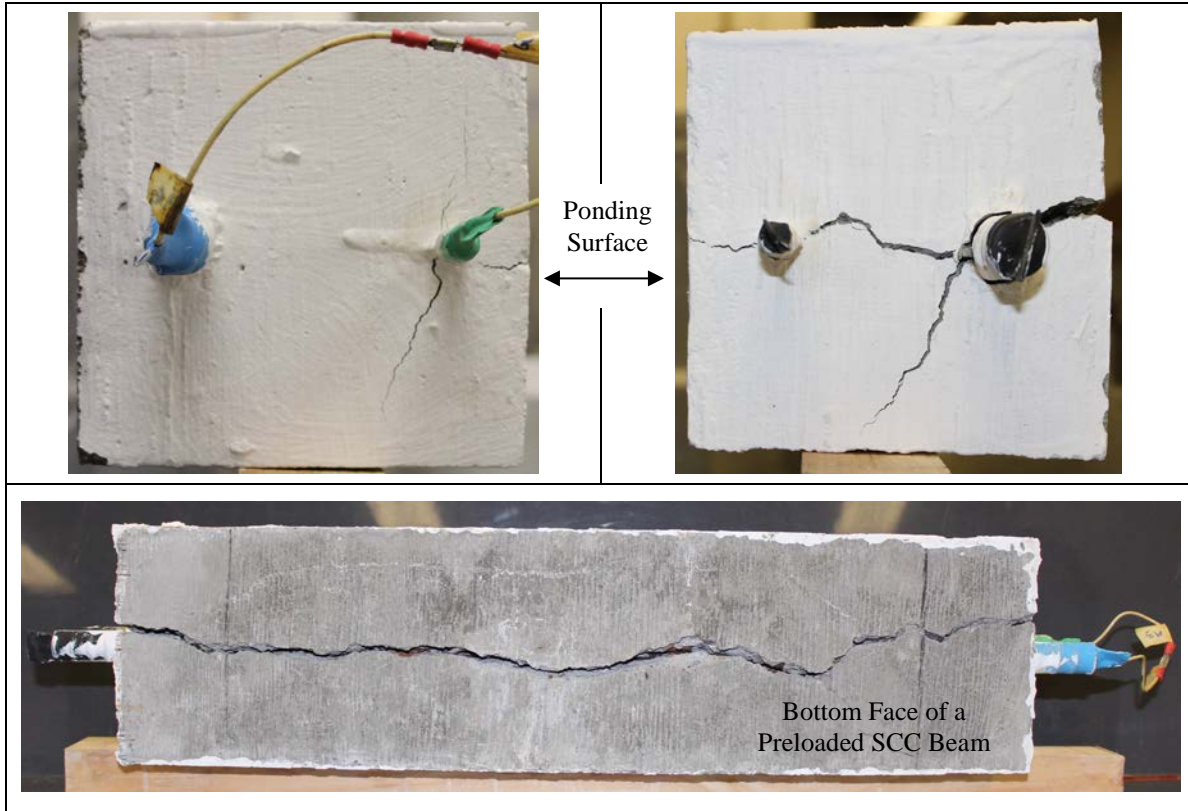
Observations of Splitting Crack Damage in Various SCC Beams
